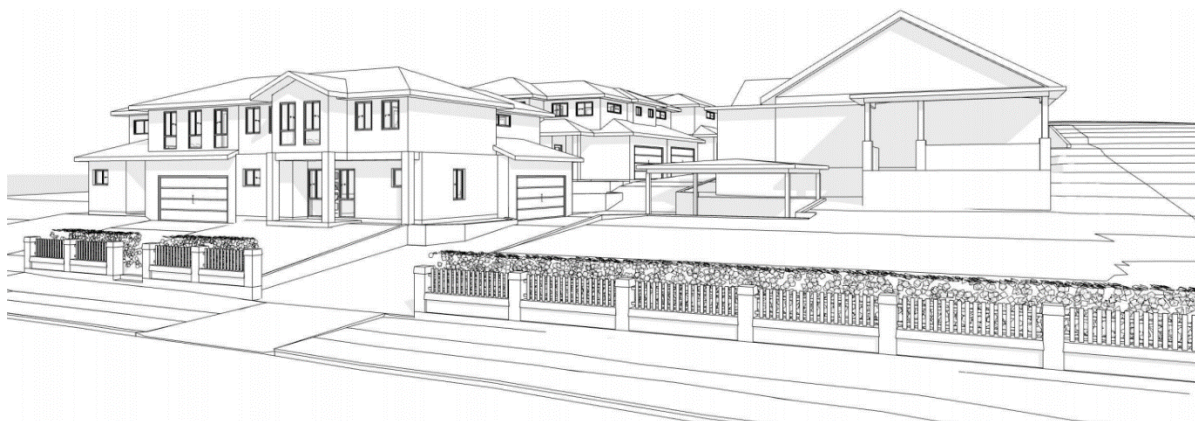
Perspective of the proposed multi-dwelling housing development of 26 Elizabeth Street (from DA 22/0535). Also visible is the carport in front of the dwelling (at right) proposed as part of DA 22/0513.
